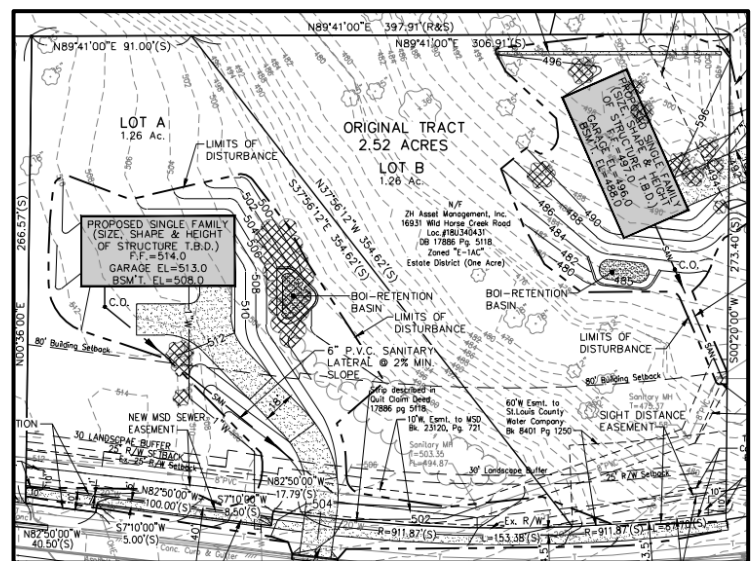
Wildhorse Acres Amended Site Development Plan (2020)
